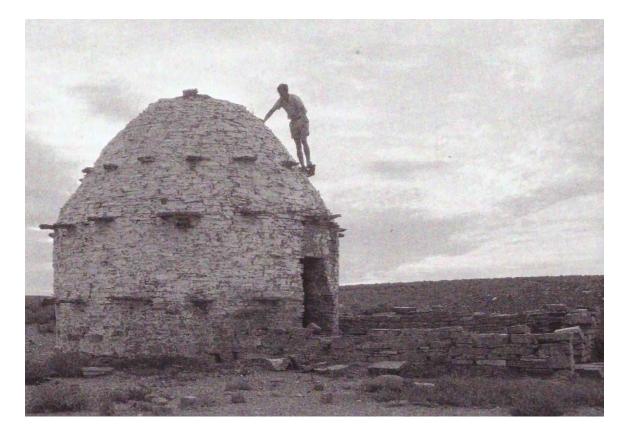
Gawie Fagan illustrating the speculated use of projecting stones as scaffolding for construction and roof repair (Fagan 2008:38)
